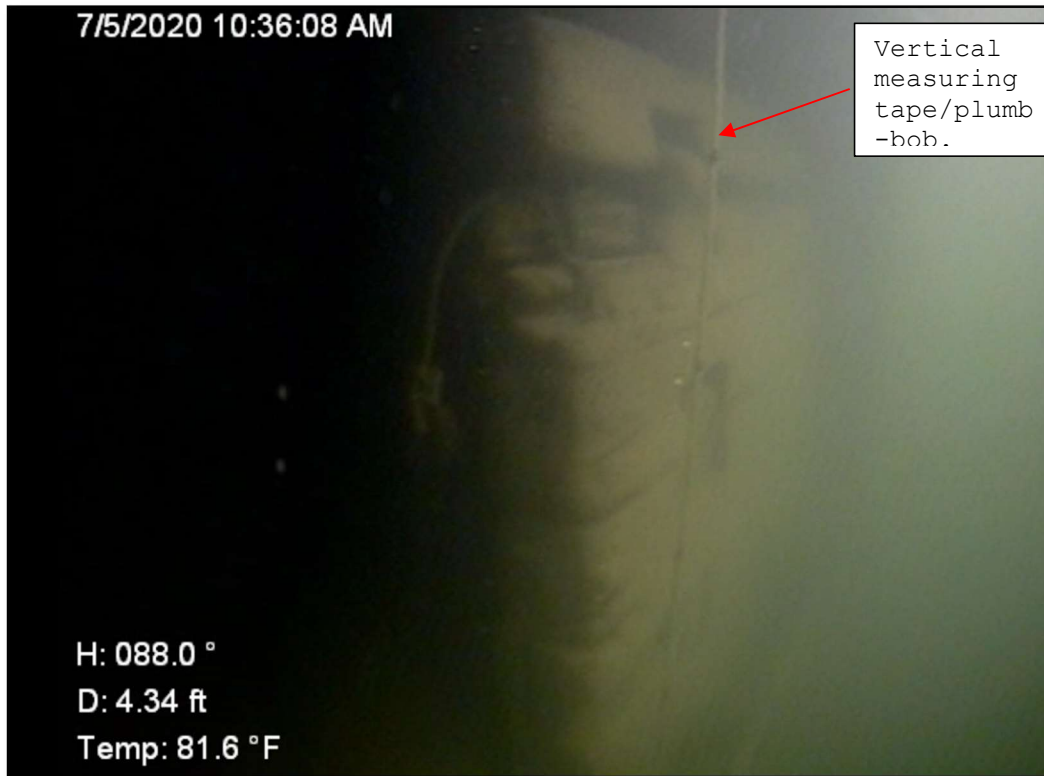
Visible Tilt of timber crib wall (7/5/20 from ROV)
